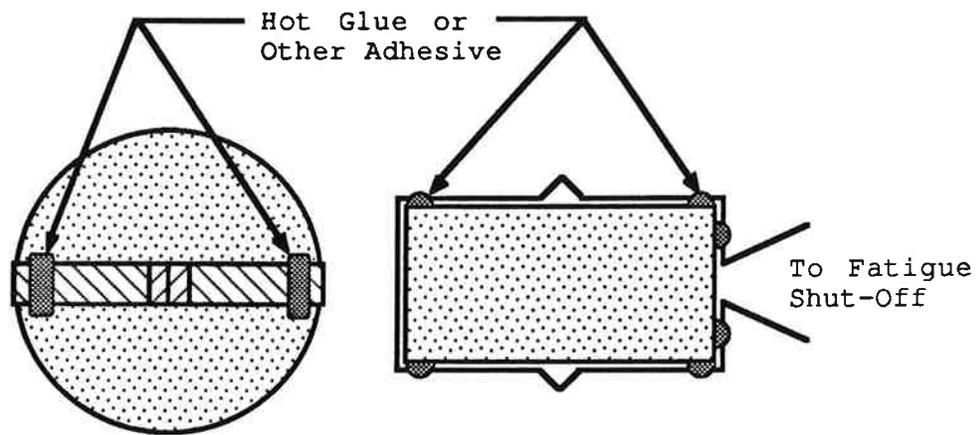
Asphalt Concrete Specimen with Foil Tape Having Loops on Both Sides of the Specimen.
